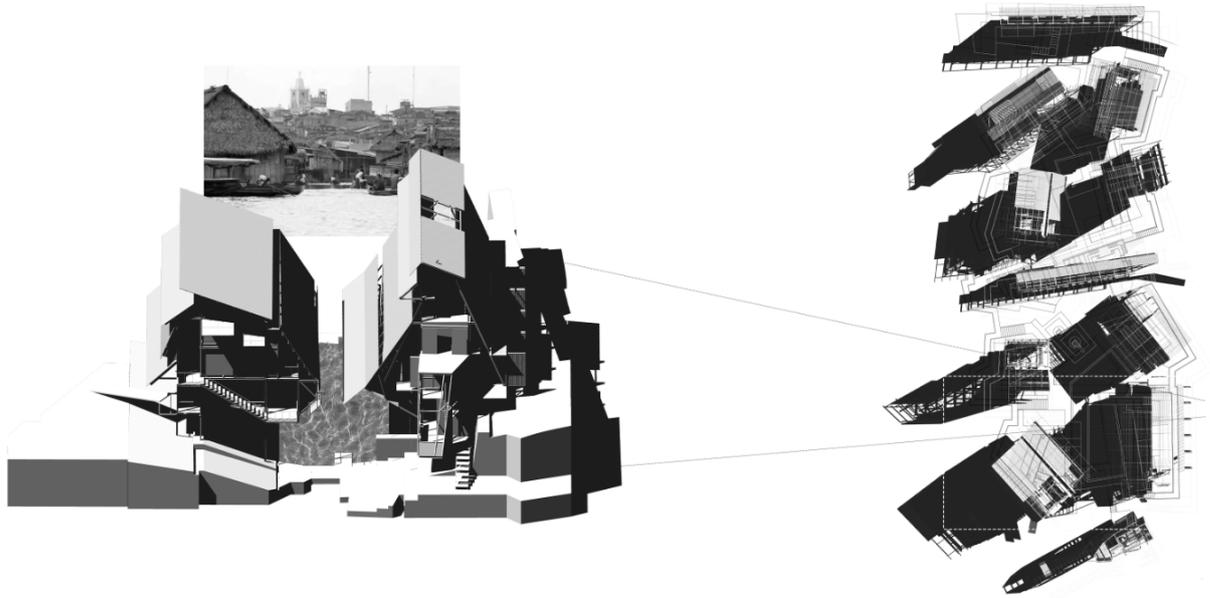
Qixuan Hu (2023). Flooding site plan. [Digital drawing]
